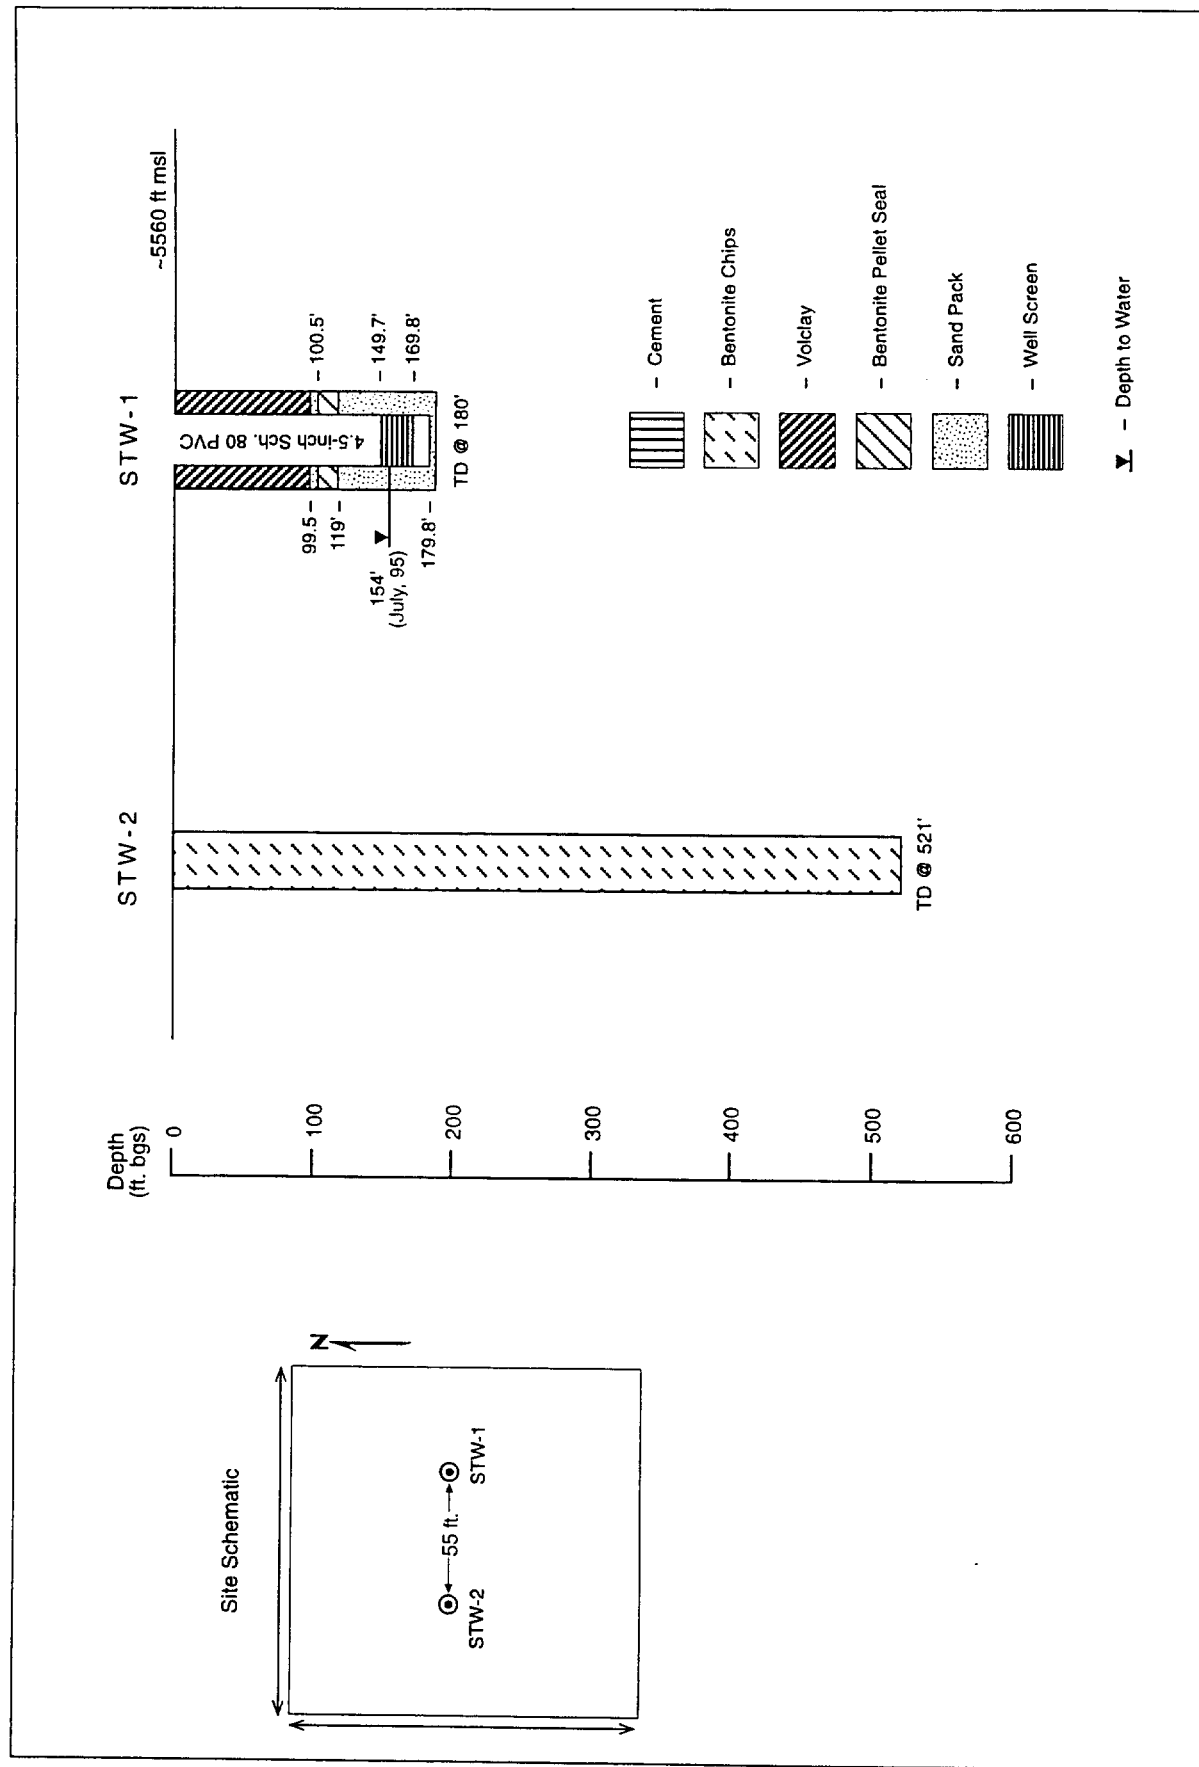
Well Completion Schematic for Solar Tower West Drill Site
